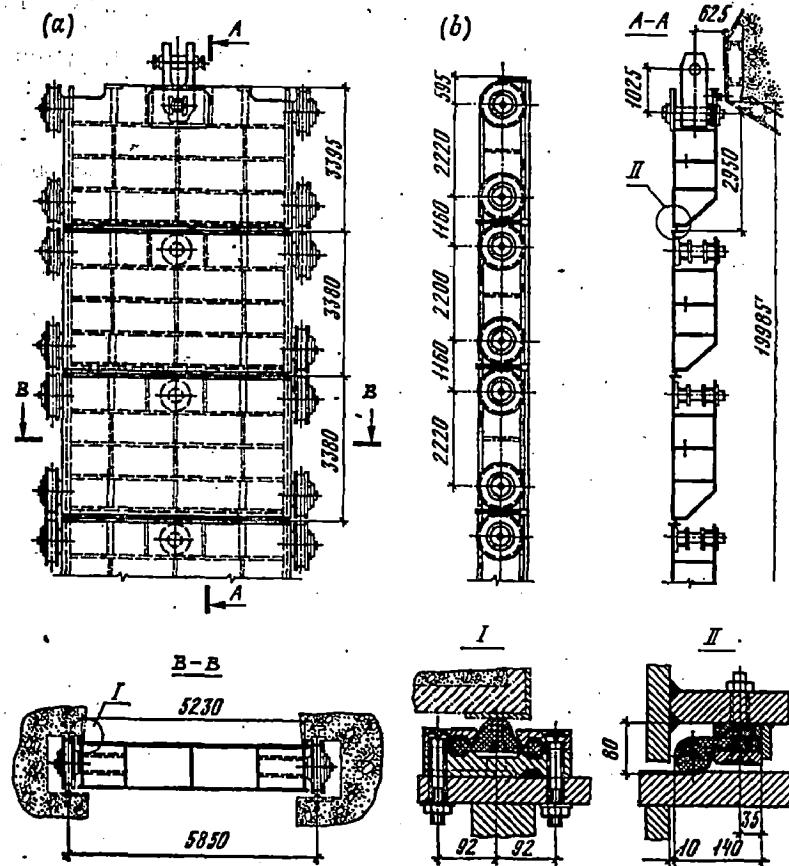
Fixed wheel vertical lift gate with multiple sections (Grishin, MM)
